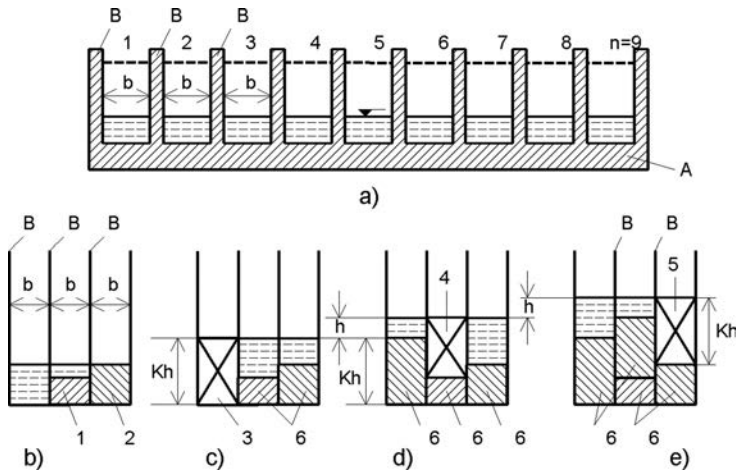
Scheme for the method of overflowing openings (a) and concreting of one three-stage section (b–e) (after Chugaev, 1985). (1) Concreted following the first placement of the gate; (2) concreted following the second placement of the gate; (3–5) the third, fourth, and fifth placement of the gate (always at the lowest sill); (6) concreted parts of the openings.
